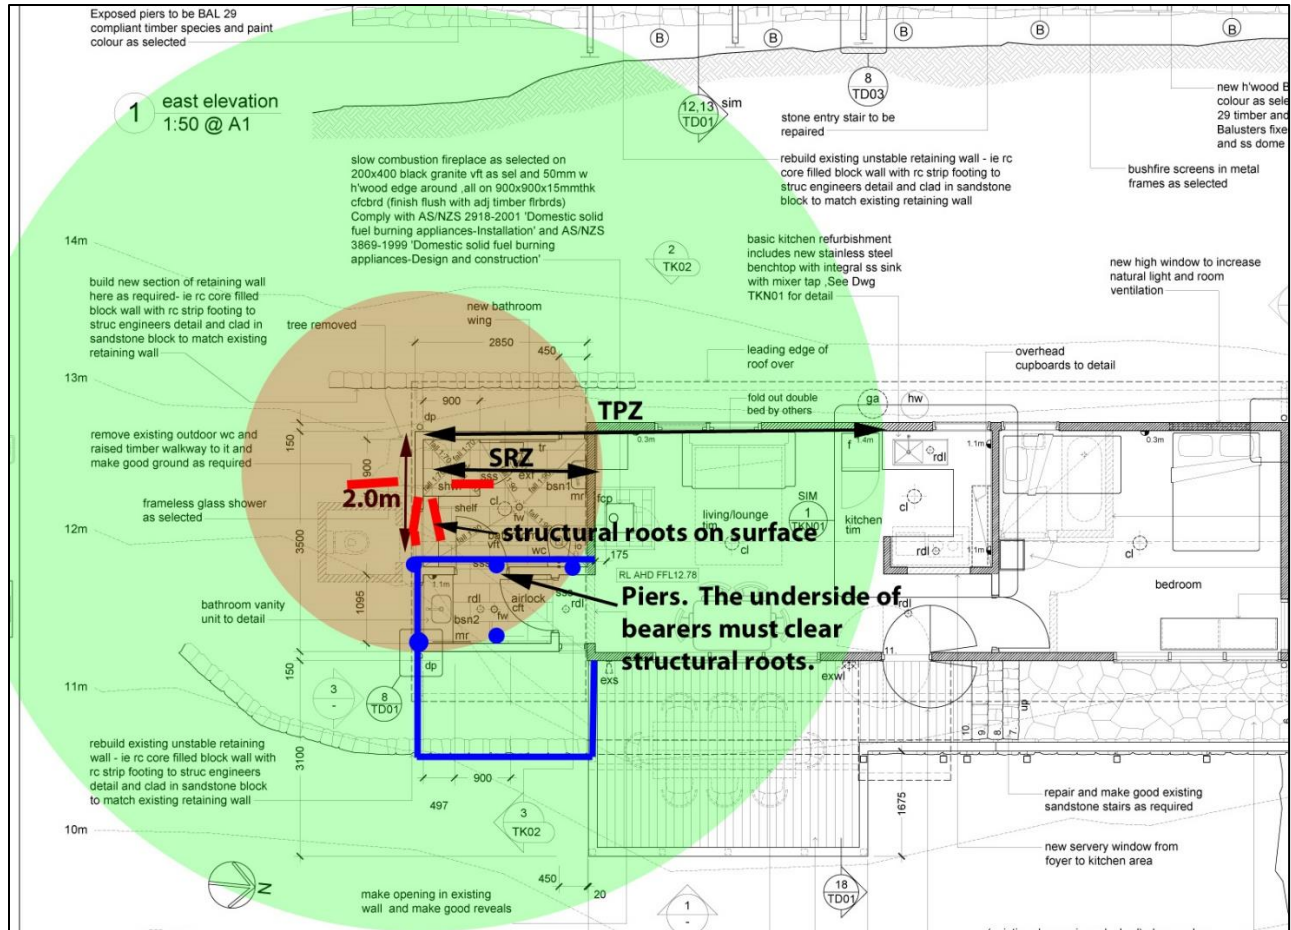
Figure A: Excerpt from the Floor Plan showing the Tree Protection Zone, Structural Root Zone and position of the bathroom that would allow tree retention.
